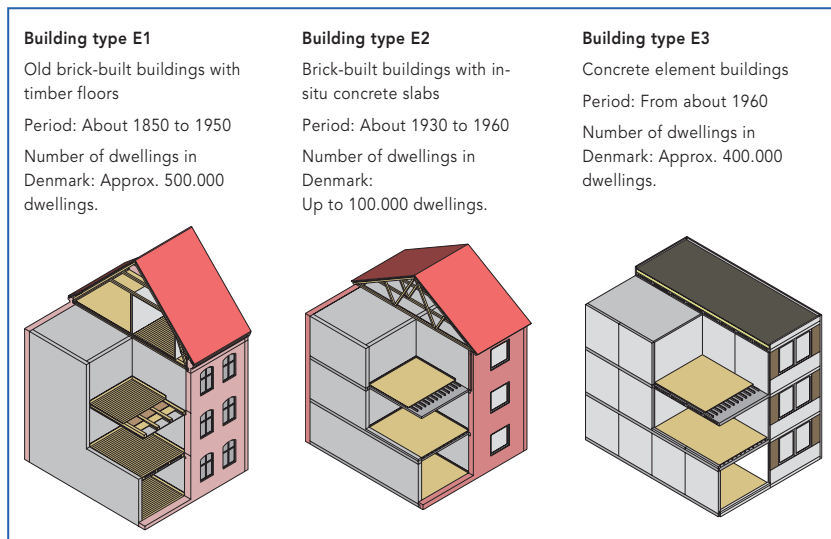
Overview of the main building types and construction characteristics for multi-storey housing in Denmark. The building types are denoted E1-E3 as in a new Danish guideline [12].
